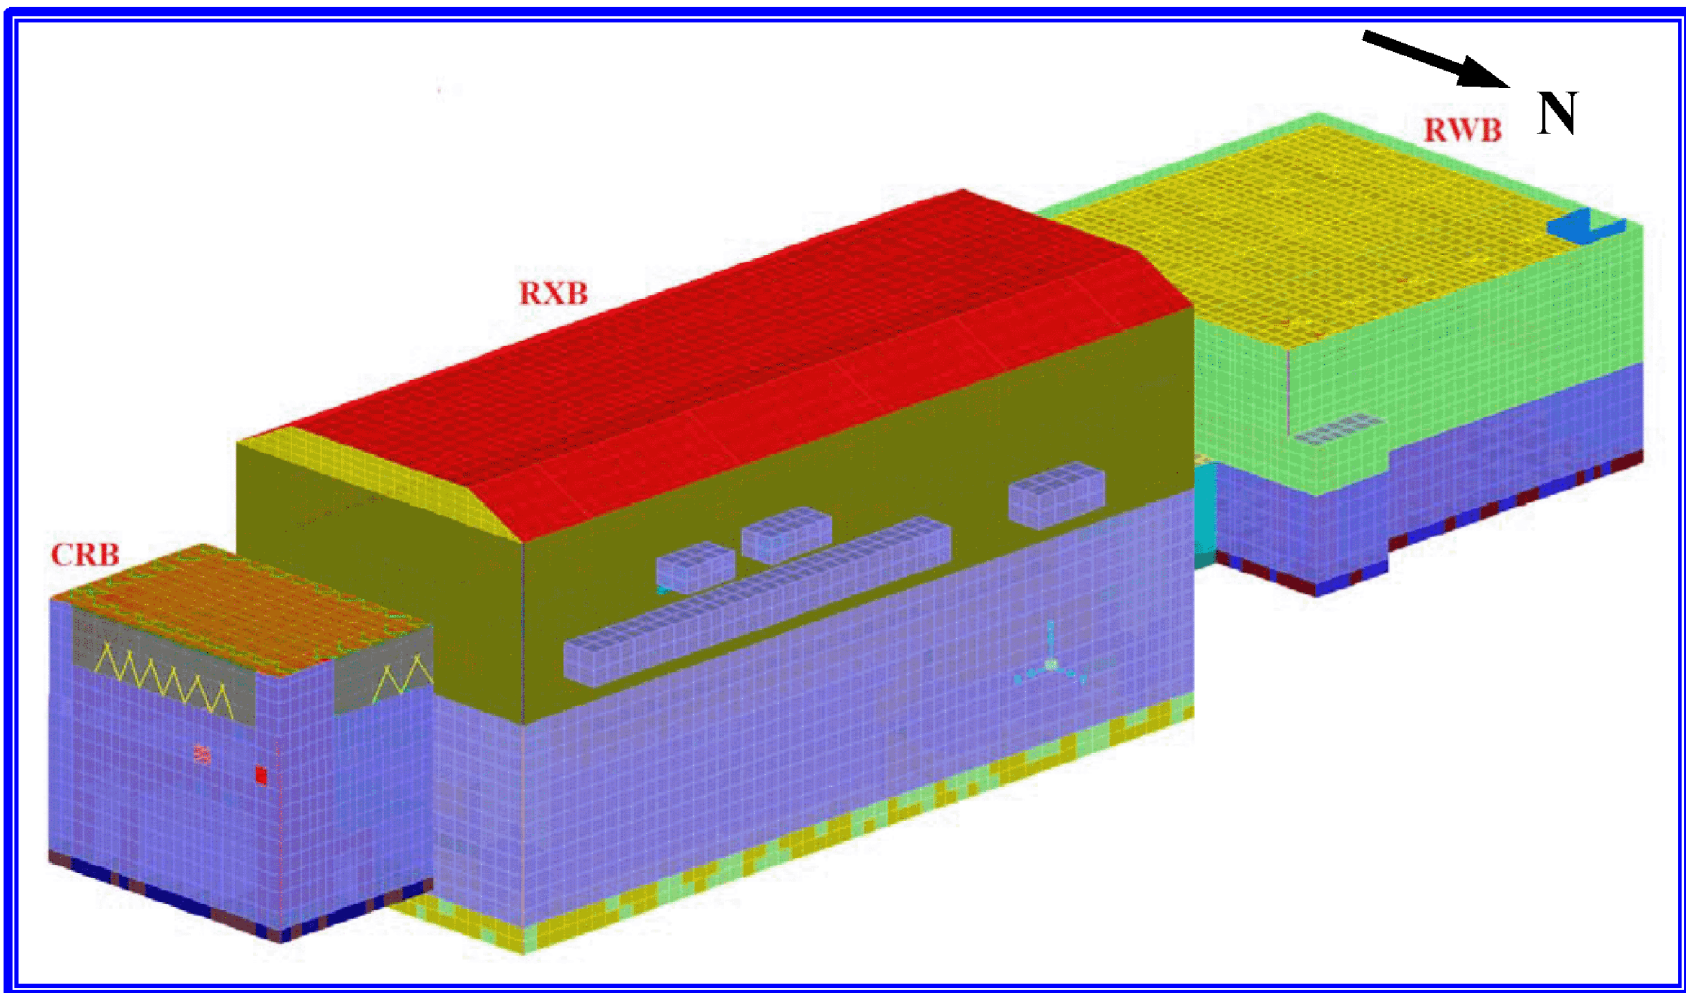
Isometric View of Backfill Soil Elements around the Three Buildings
